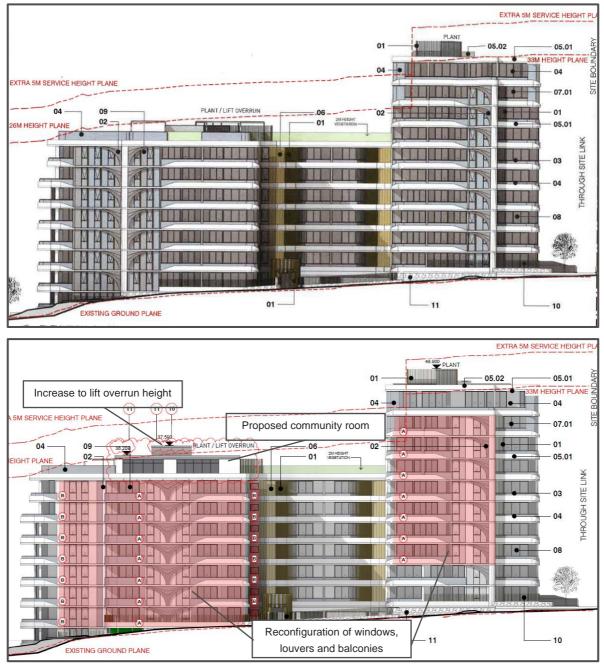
| Northern elevation of Building 1: approved (above) and proposed (below) (source: SSD 9403 Approved Plans and Applicant's RtS)
